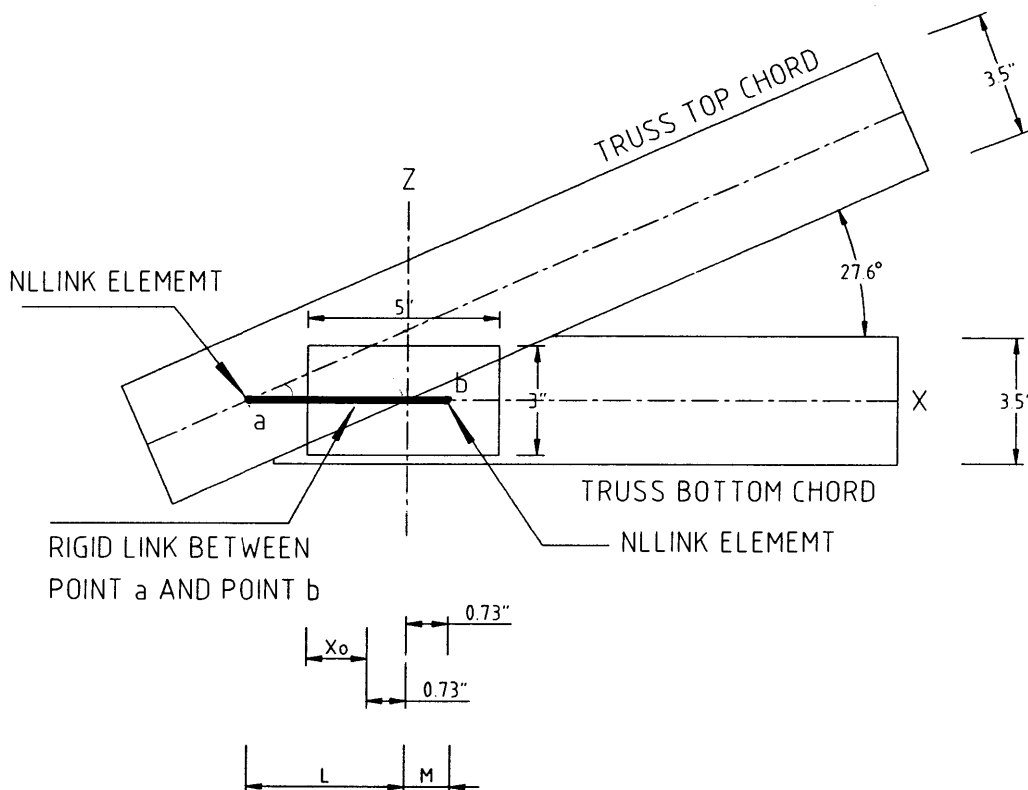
Heel Joint Detail in the Truss Types A, A1, and A2
